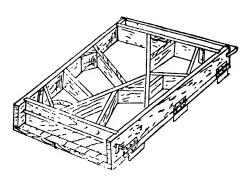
Fig. A.- -Wooden Mould with Division Pieces for casting Concrete Slabs.
